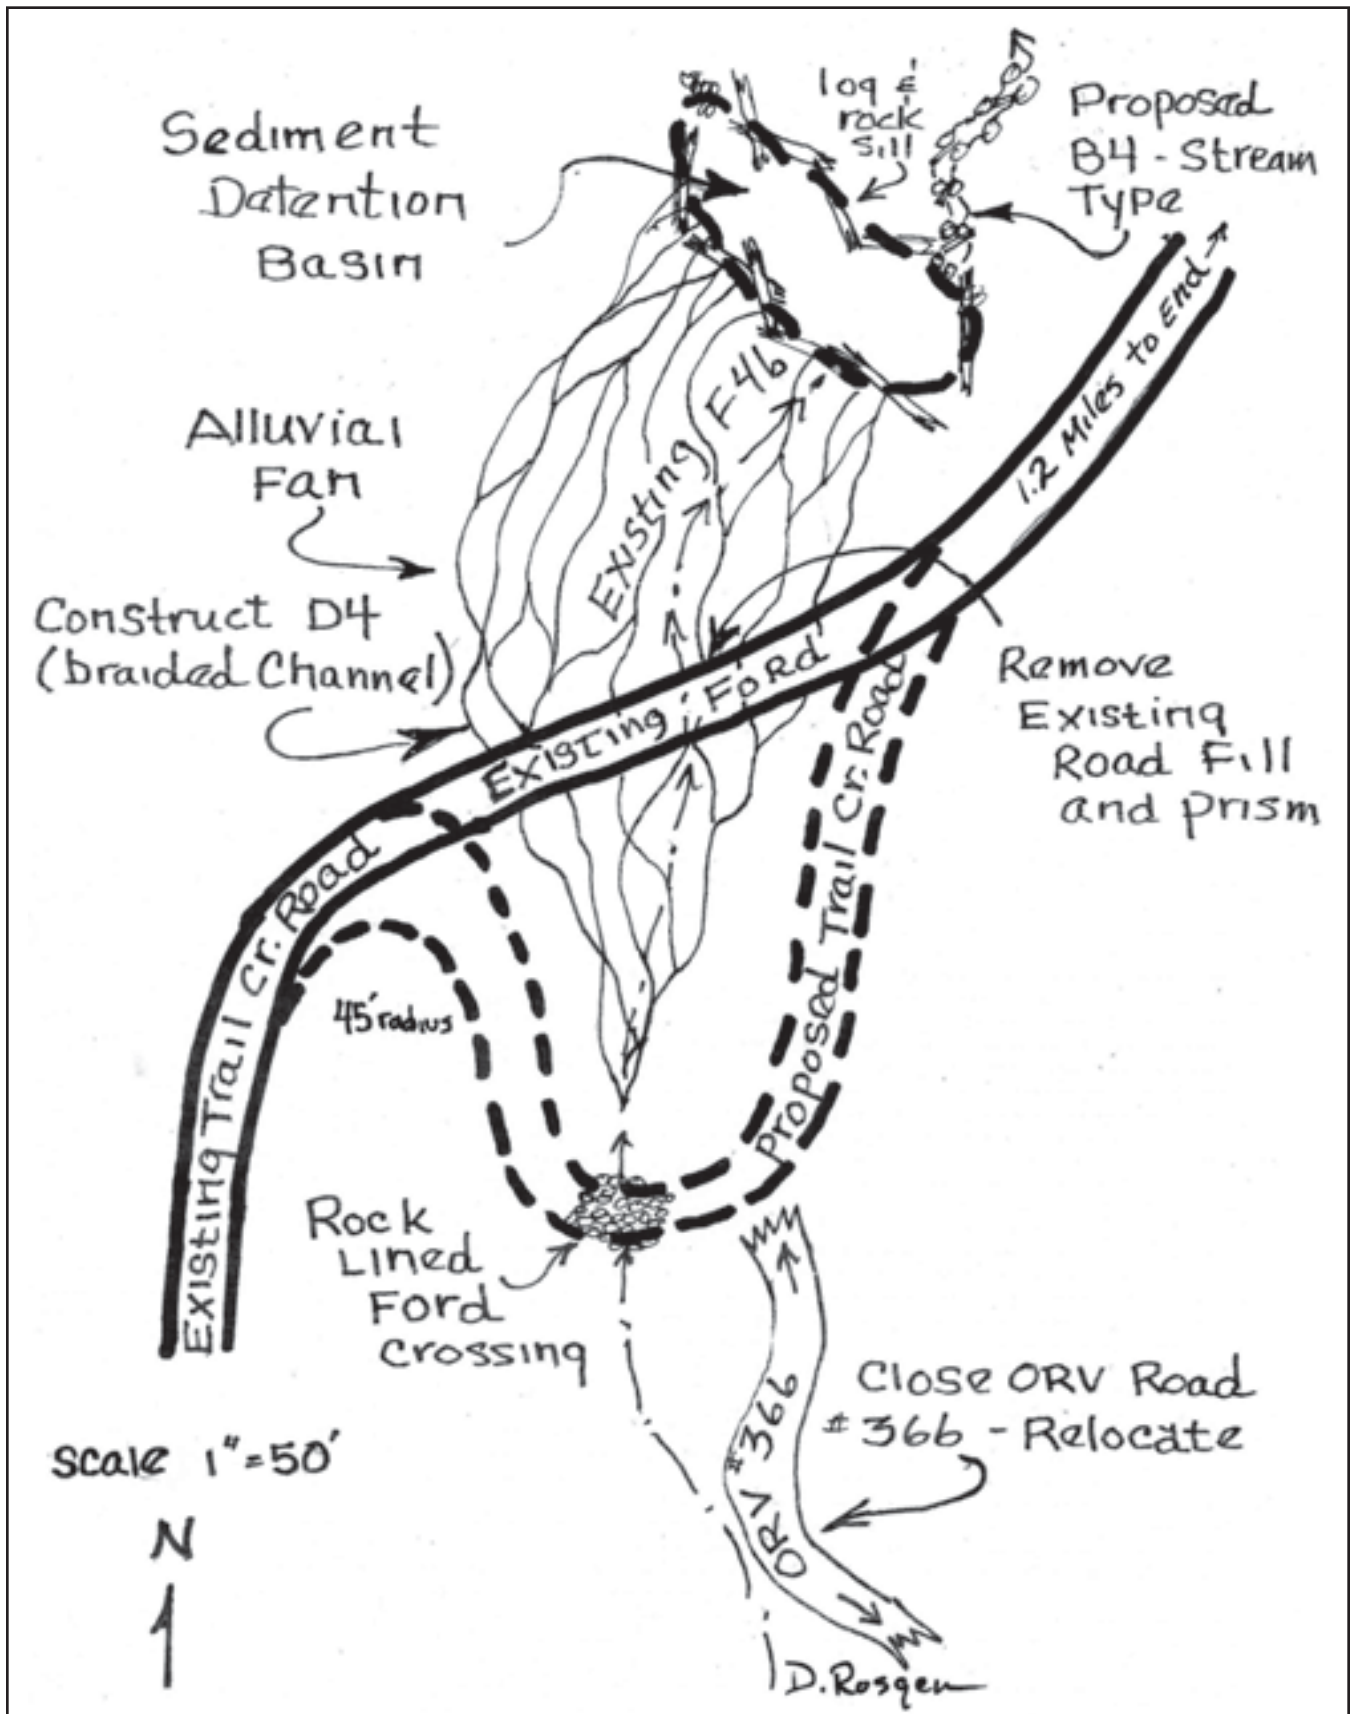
Road 336 relocation to prevent existing road surface and fill erosion in conjunction with converting the F4b to D4 stream type with a sediment detention basin on the alluvial fan and drained by a step-pool, B4 stream type.
